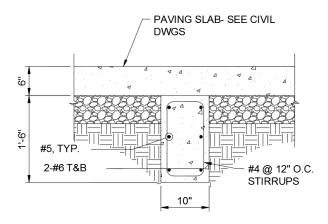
Section (E) 10" Grade Beam for Interior Load Bearing Walls-Proposed Design
